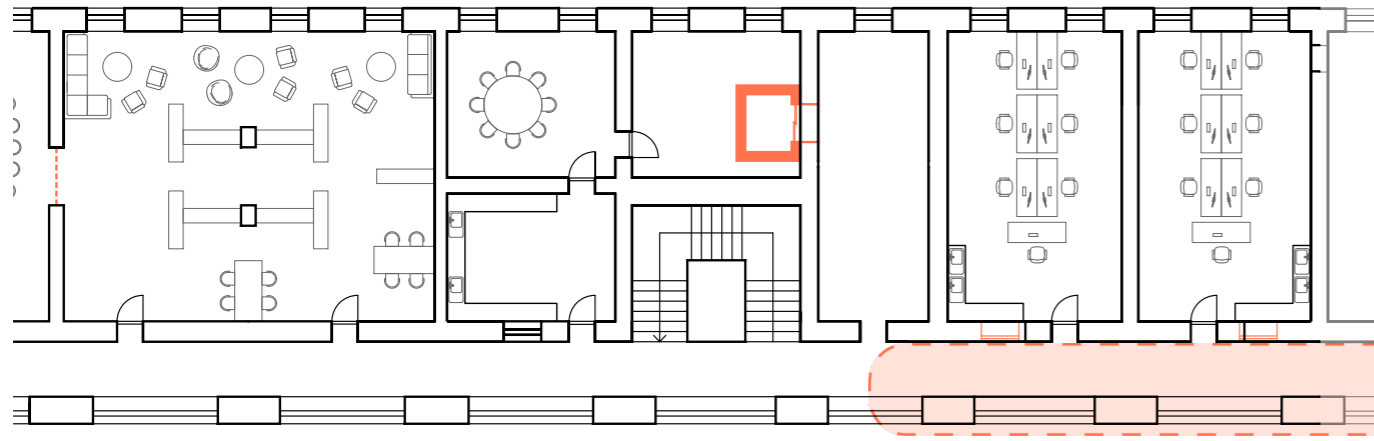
Second floor community reading room, co-working spaces and corridor, with reconstructed section highlighted
